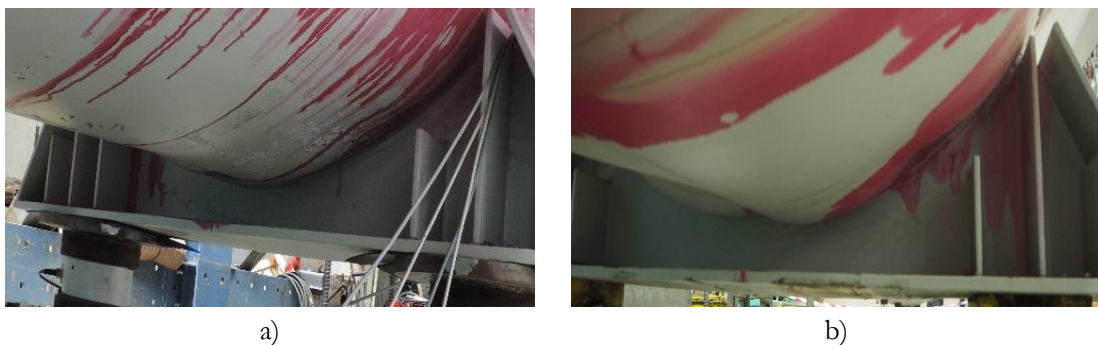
Failure mode of the bottom curved panel: a) specimen S460; b) specimen S690
